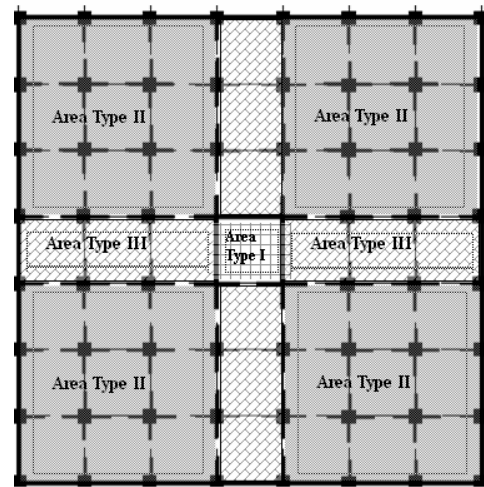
Divide the Floor Plan into 9 Blocks According to the Dimension
